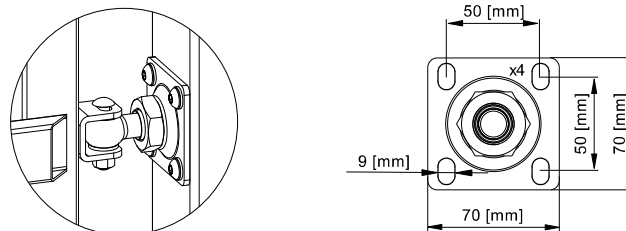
Wicket: standard installation type (CLASSIC, VARIO, STYLE, PREMIUM, LUX, and MODERN systems with installation on concrete posts).
